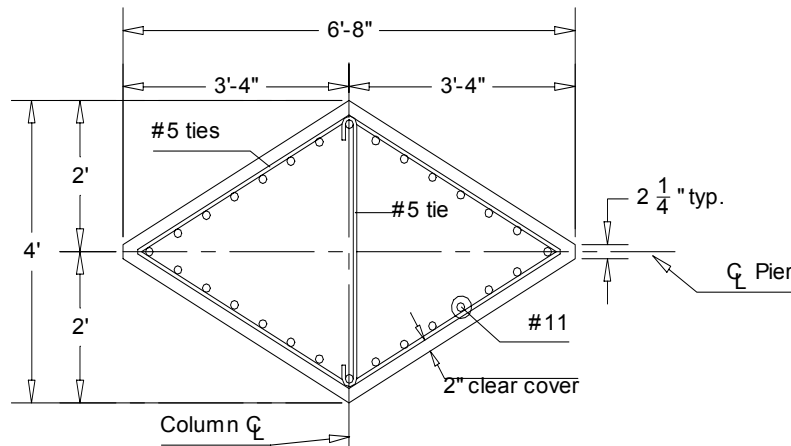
Typical column cross section in multi-column piers (1 in.= 25.4 mm)
